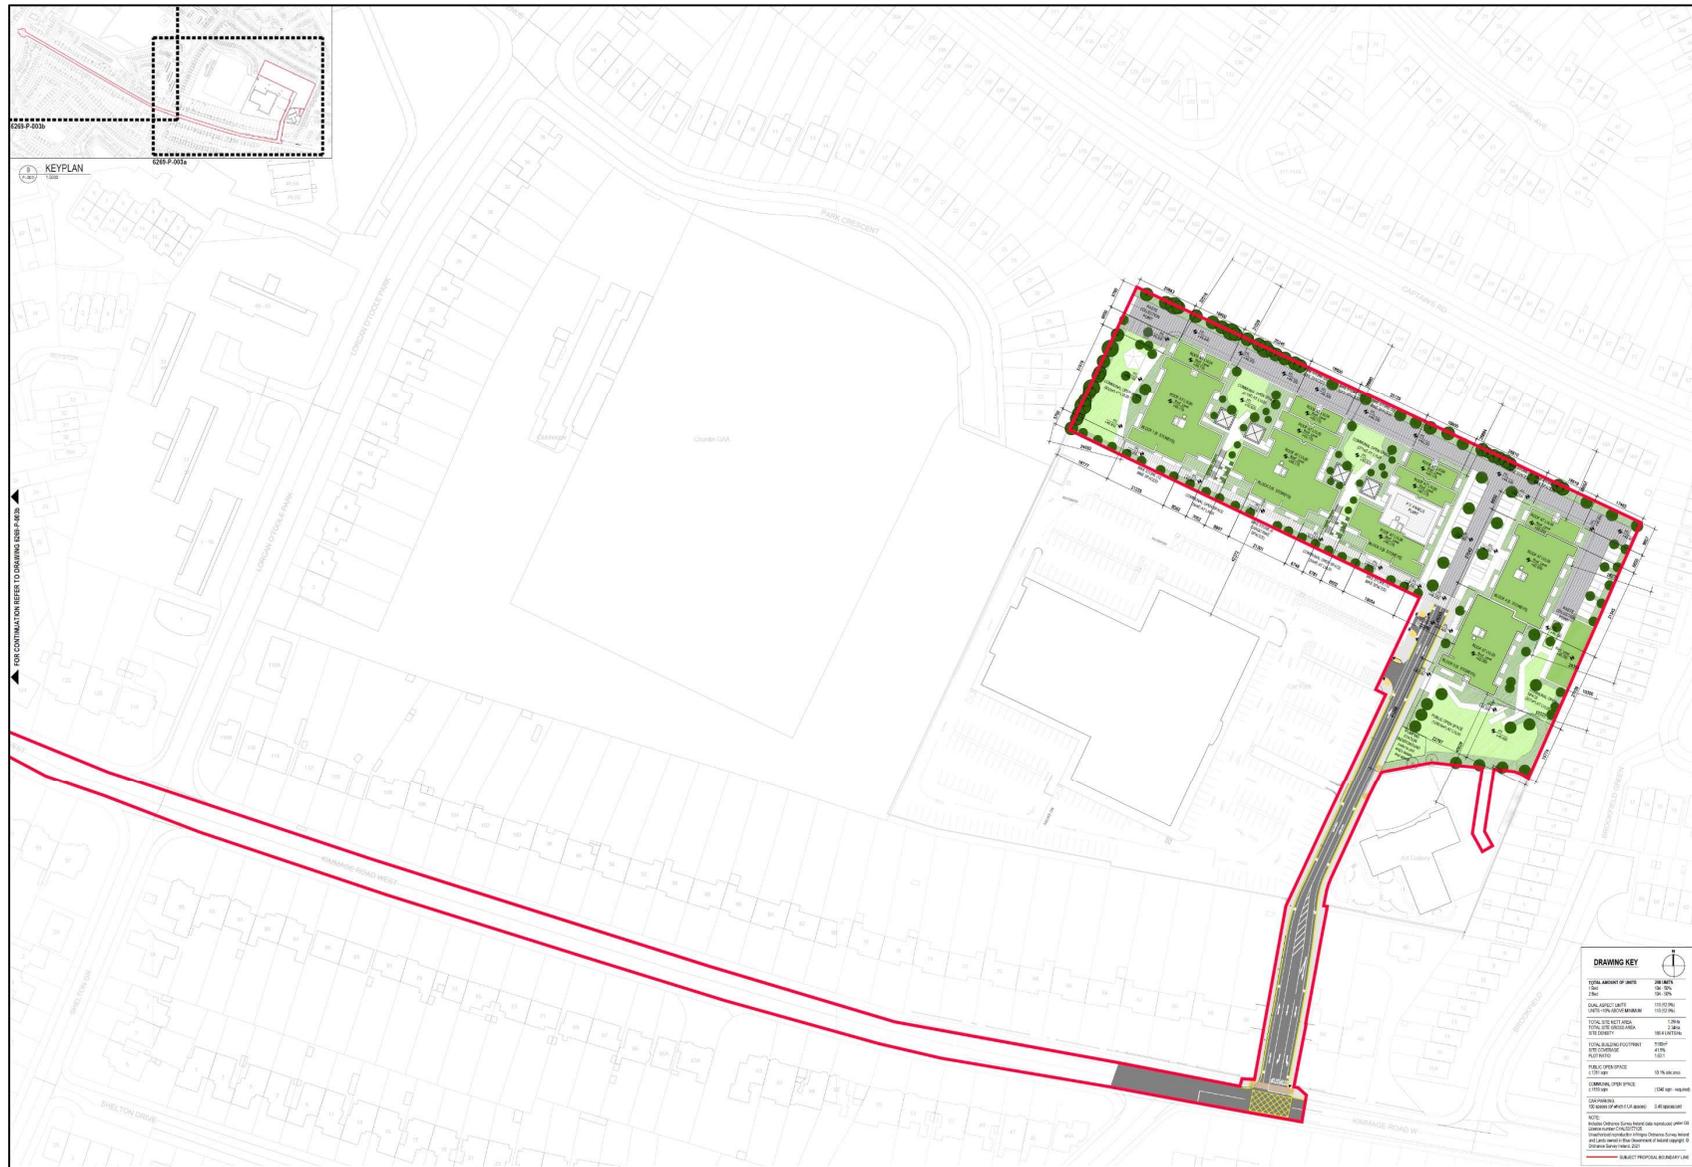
Plan of the Proposed Development. (Note; the site boundary continues west along Kimmage Rd. West to facilitate connection to municipal sewer)
